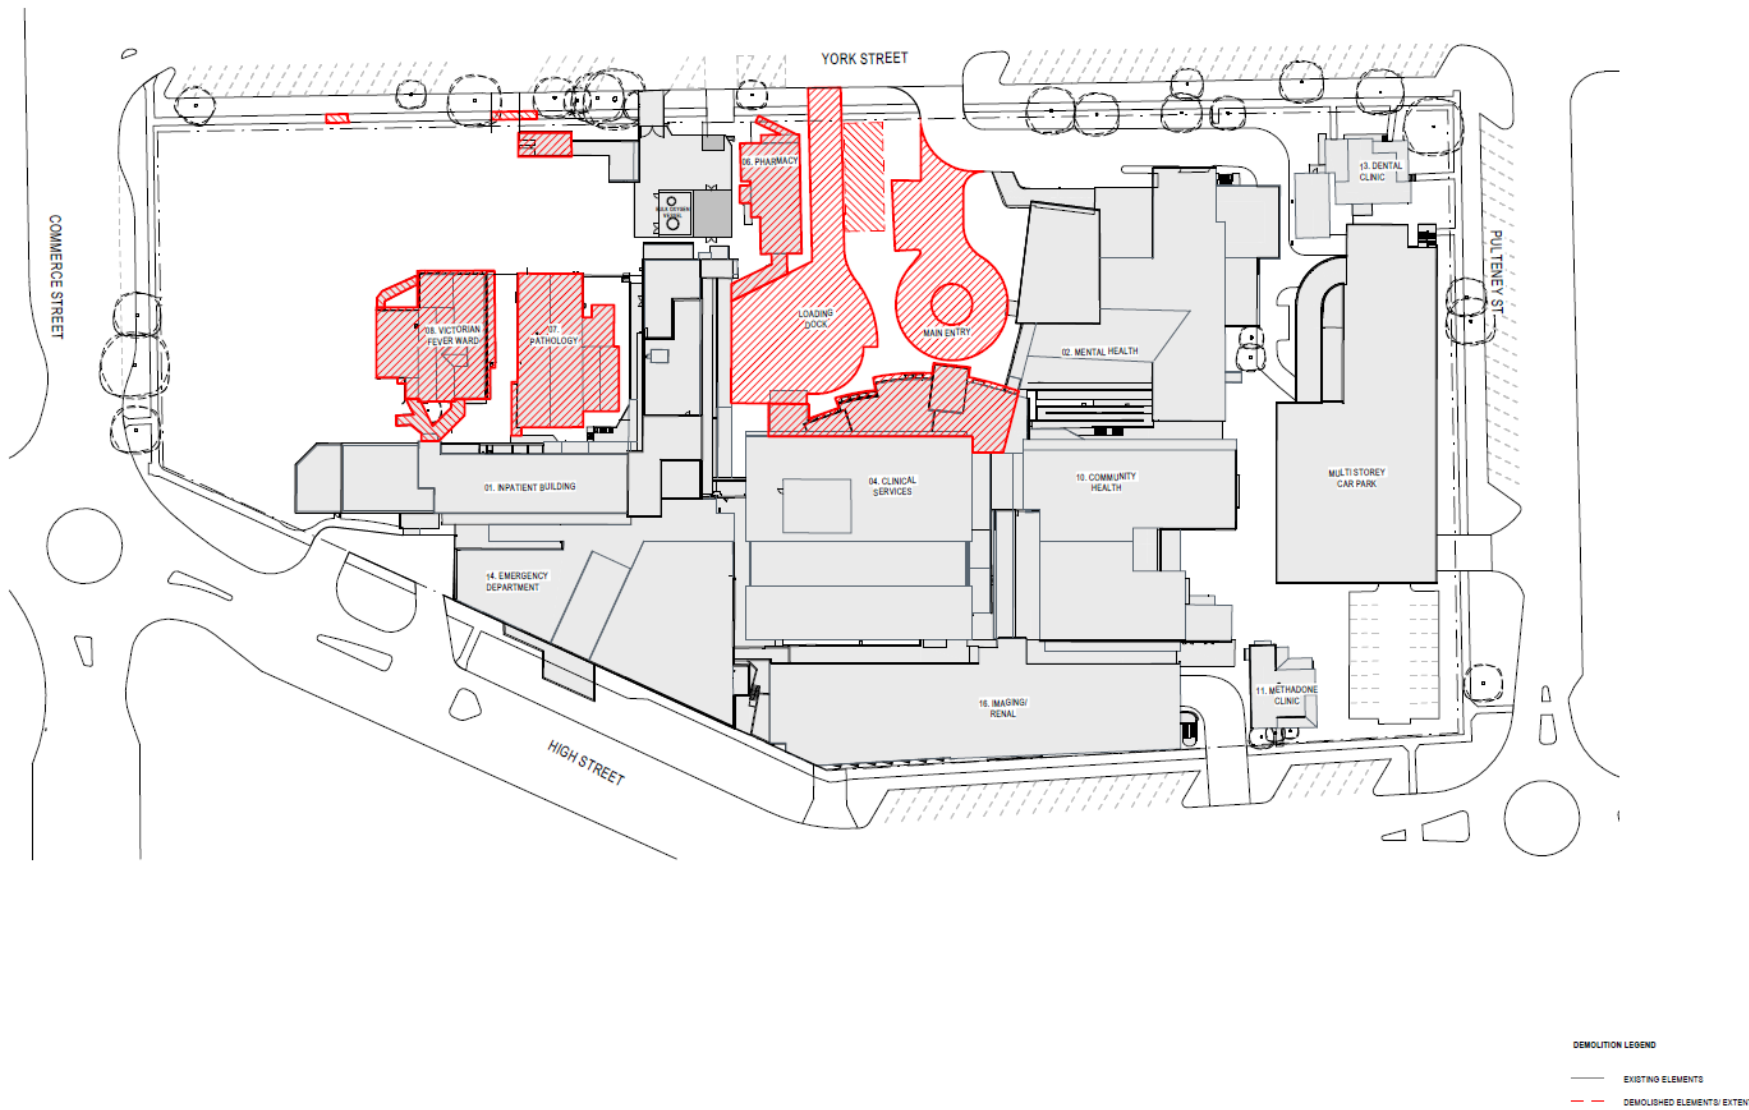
Site plan of proposed masterplan demolition works. Source: BNV-AR-SSDA-10A issue 2
